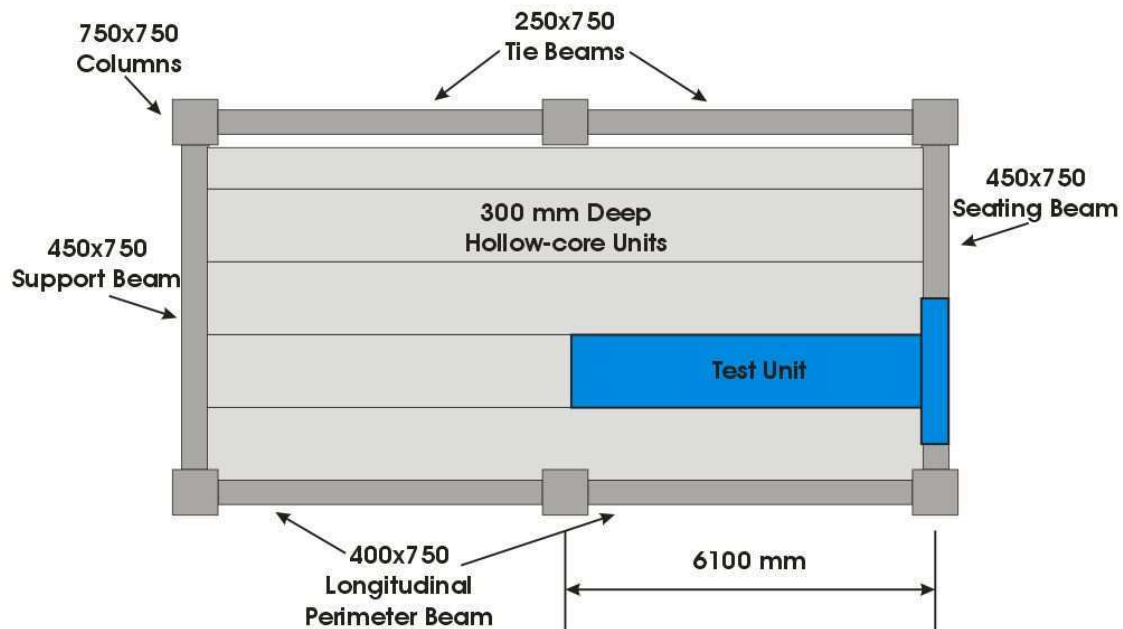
Plan of hollow-core super-assembly tests showing sub-assembly test origin (Jensen 2006)
